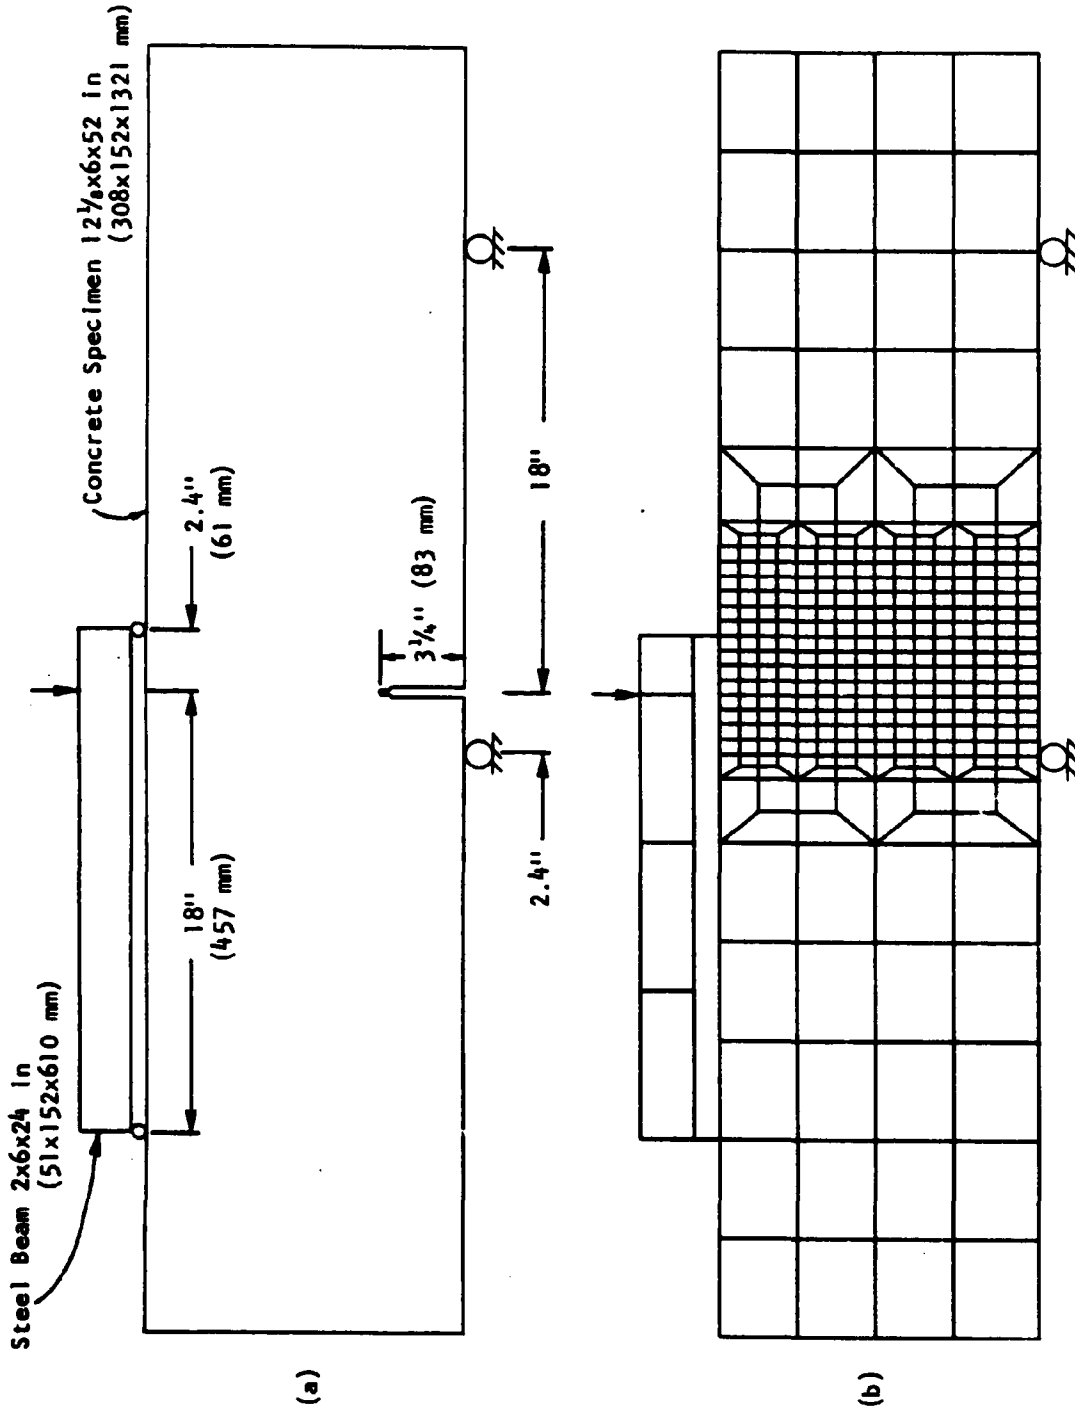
Cornell Mixed Mode Fracture Specimen (Series B): (a) Specimen Geometry and Loading Configuration, (b) Finite Element Model
